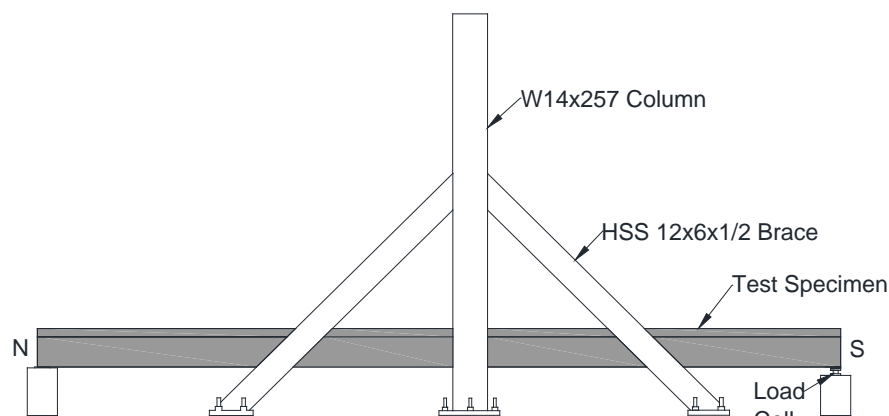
shows the full-scale bridge test setup. A 146-kip hydraulic actuator was used to apply point loads at the mid-span on girder A (Fig. 5.16a) with 11-in. offset from the joint centerline. The load was applied on a 1.5-in. by 10-in. by 20-in. steel plate, which was seated above a plaster (Fig. 5.16b). The plate area represents the truck tire loading area. Water dams (Fig. 5.17) were formed above the rehabilitated longitudinal joint to identify leakage.
